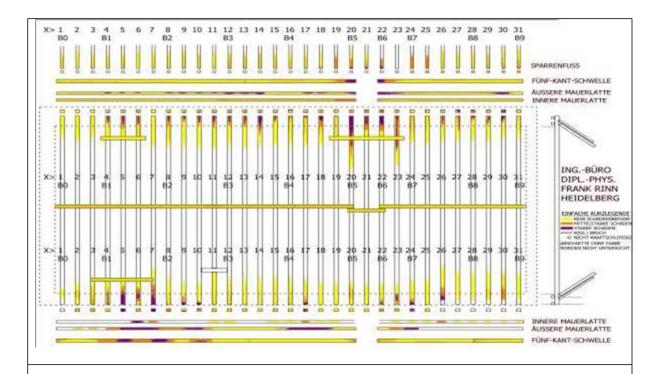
Ceiling beams of a historic church plus underneath wall beams and the foot parts of looming rafters. This one sketch replaced several dozen sketches of all axes of conventional documentations
